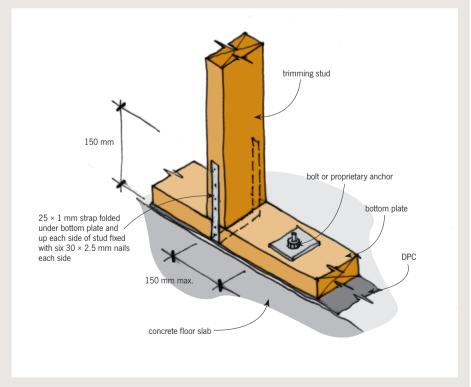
Fixing the trimming stud to the bottom plate on a concrete floor slab.
